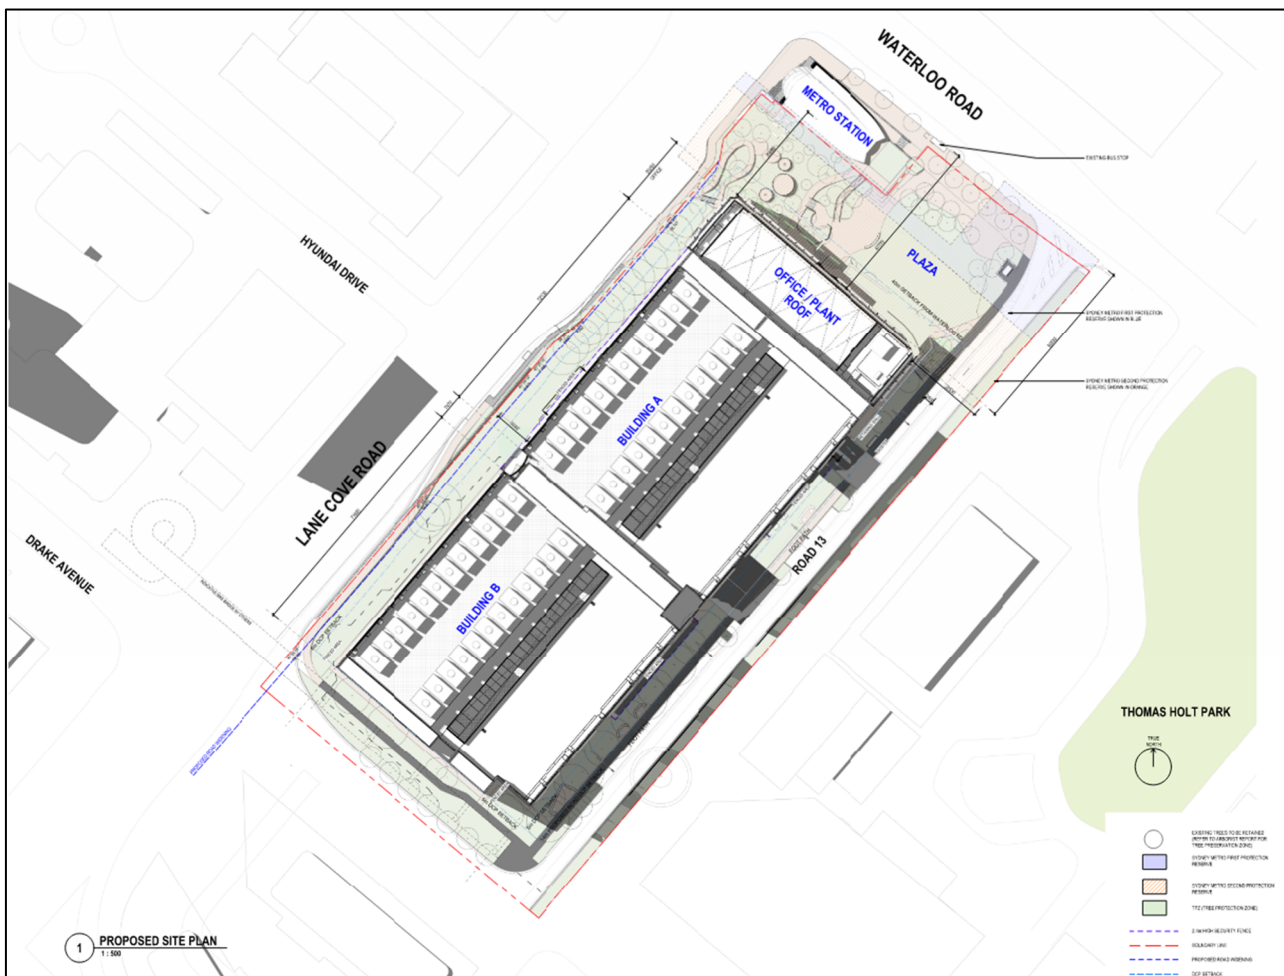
Proposed Site Plan (Source: HDR Architecture dated:26/08/2025)
